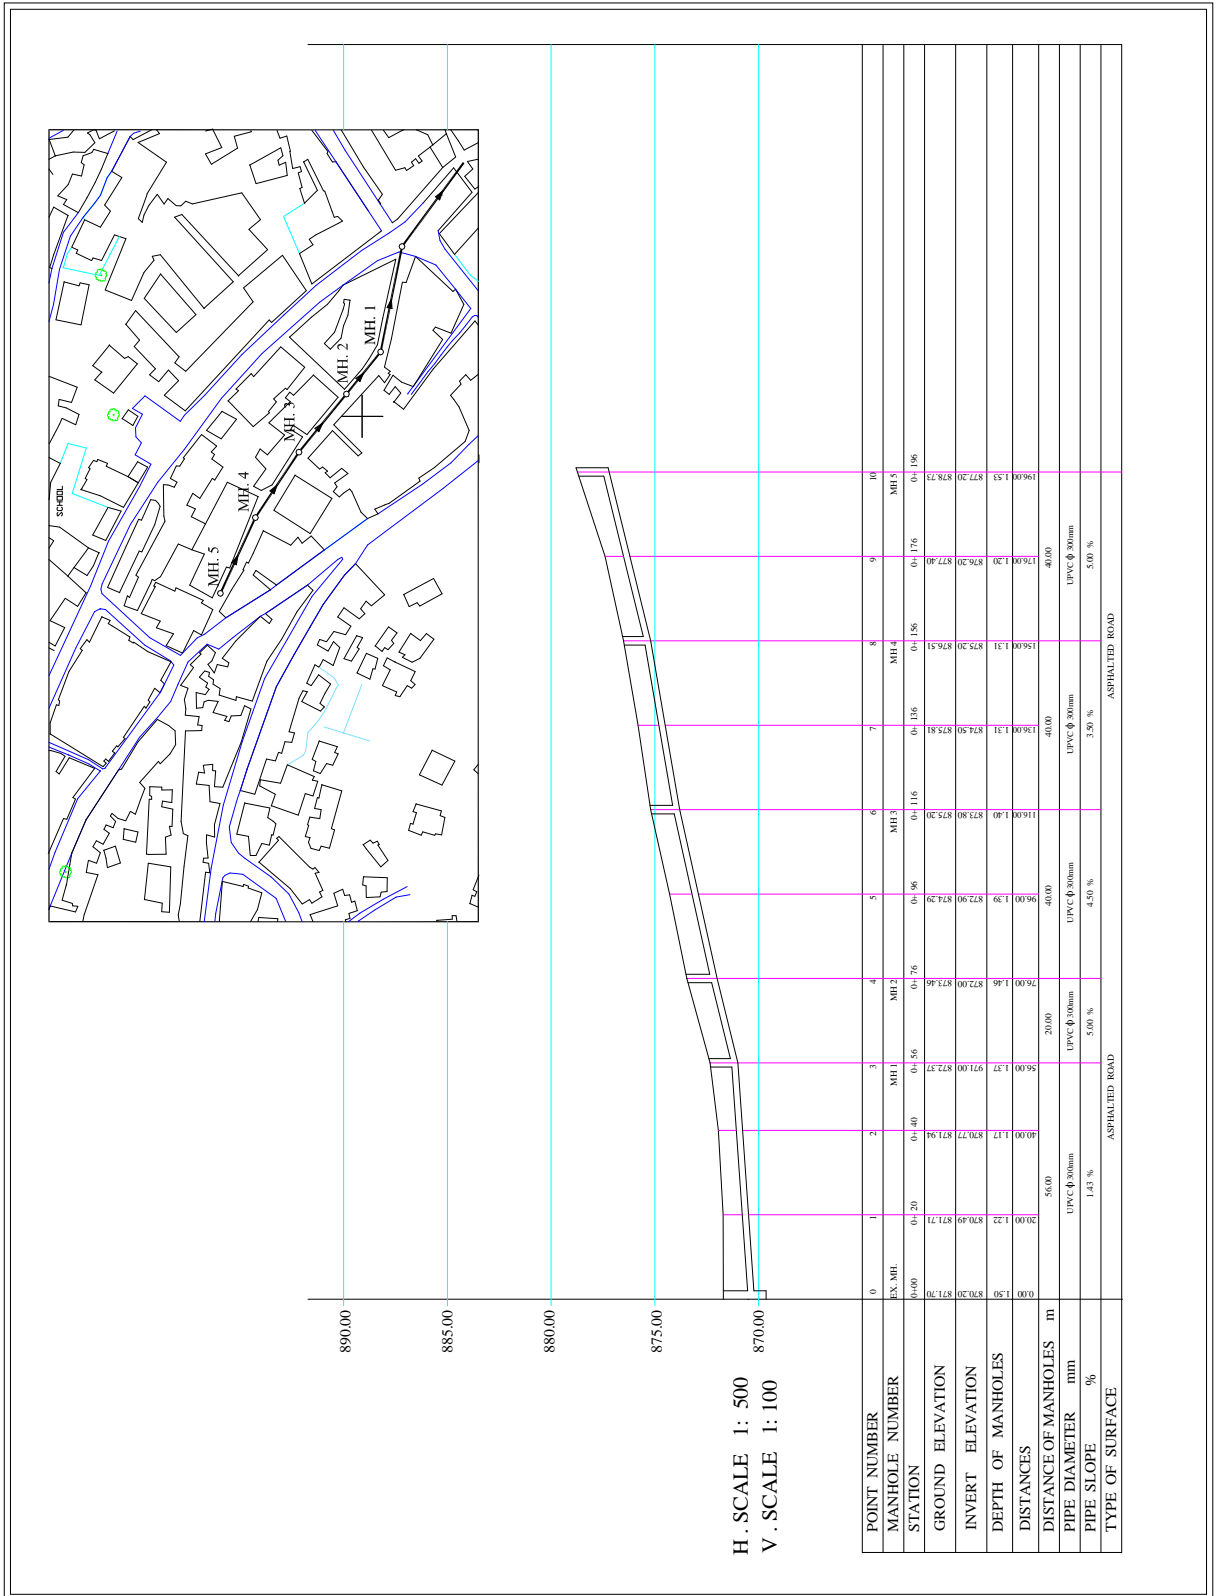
Typical Plan and Profile Drawing for Sanitary Sewer
